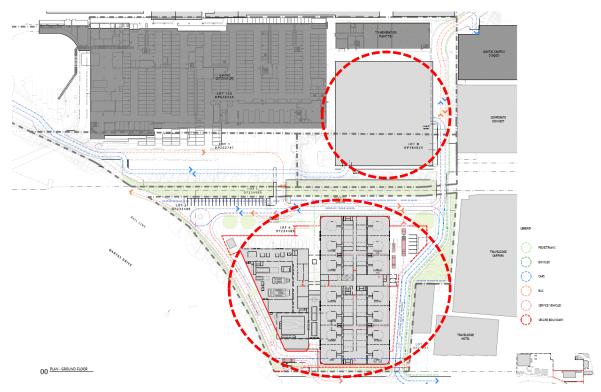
Extract of proposal – site plan with proposed works circled in red
